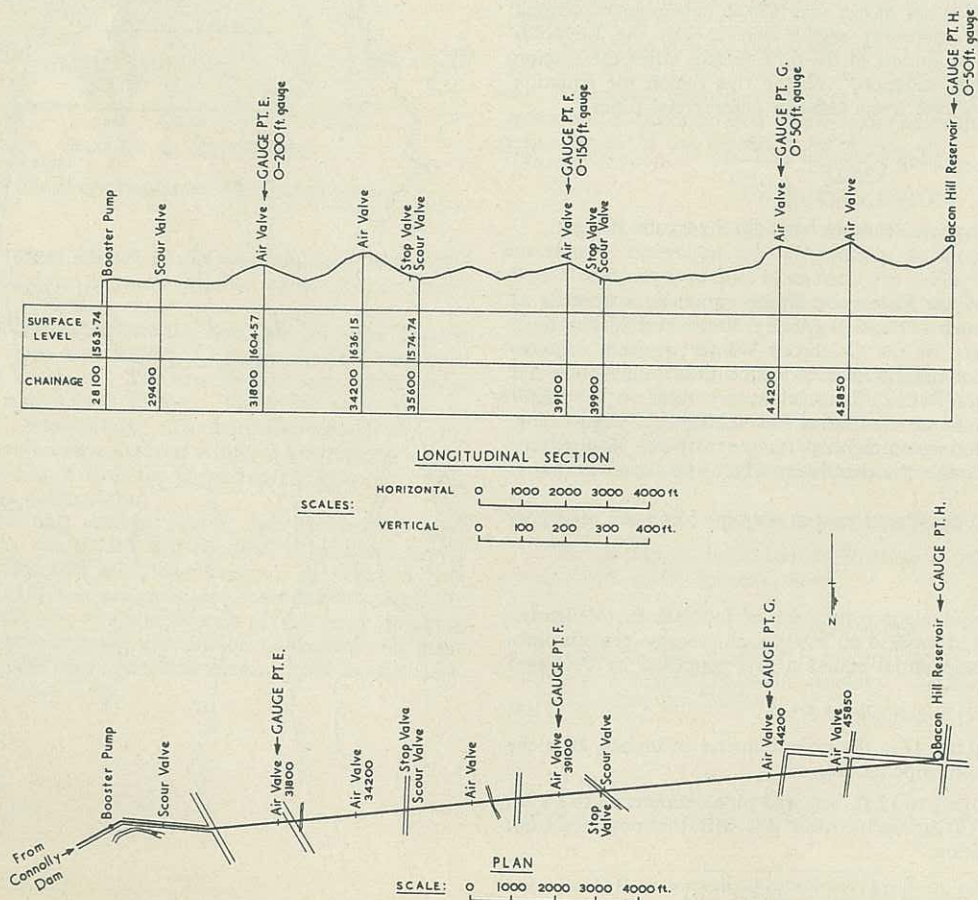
Warwick Pipe Friction Tests—Pipe Details—15-in. Pipeline.
